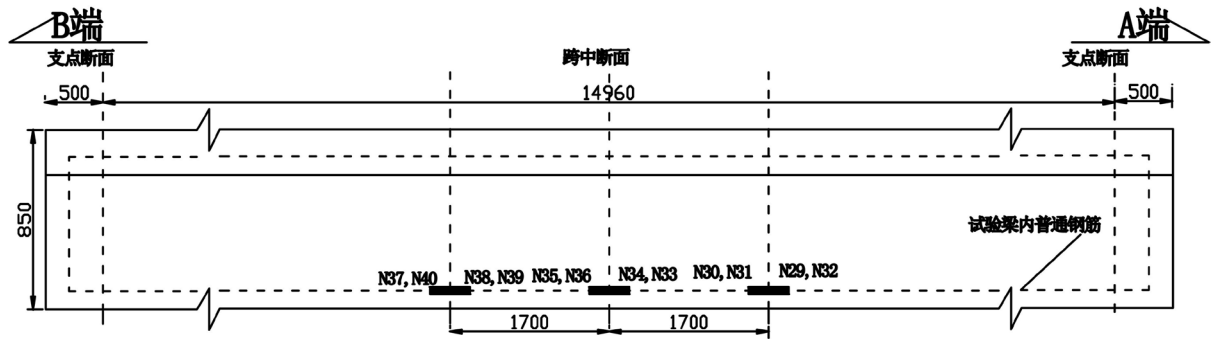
Layout of longitudinal steel bar strain measuring points (unit: mm)
